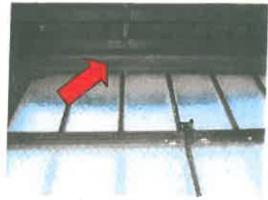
Gray painted wood beam above high-bay windows in Room 1 - LBP
